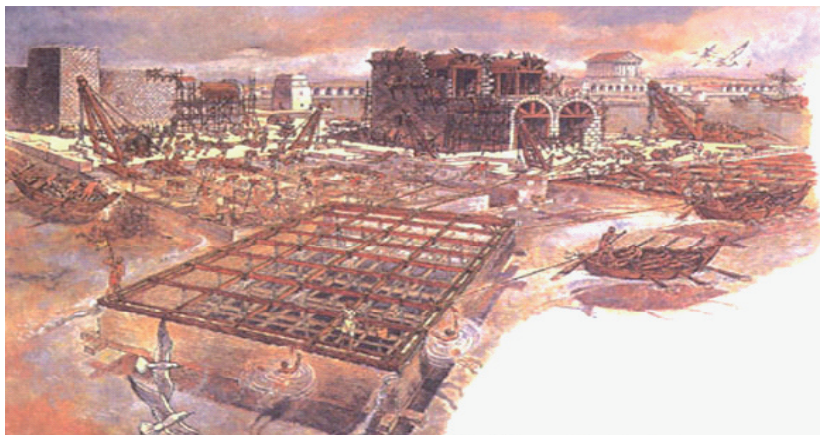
Drawing of a caisson wall Caesarea 100 BC [Navis]
